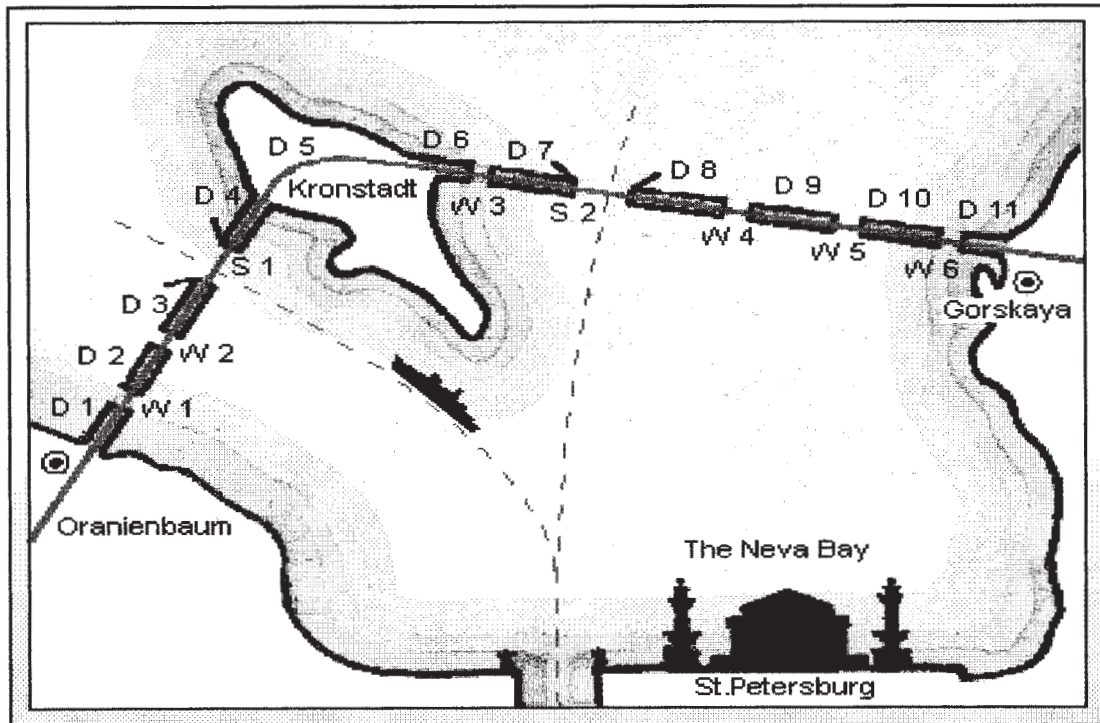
Plan of the Flood Prevention Facilities Complex (a design): D1–D11: dams; S1–S2: ship outlets; W1–W6: water outlets
